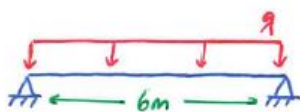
Scheme of the floor layer & ceiling permanent loads acting on the cross beams.
